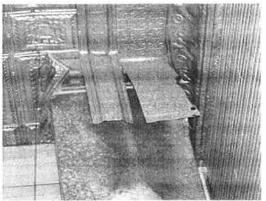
HVAC penetrations have done significant damage to the historic metal ceiling in the District Courtroom.
